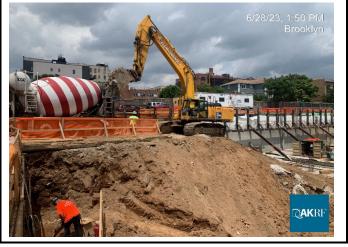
Backfilling behind SE wall in Grid 15, view facing south.
